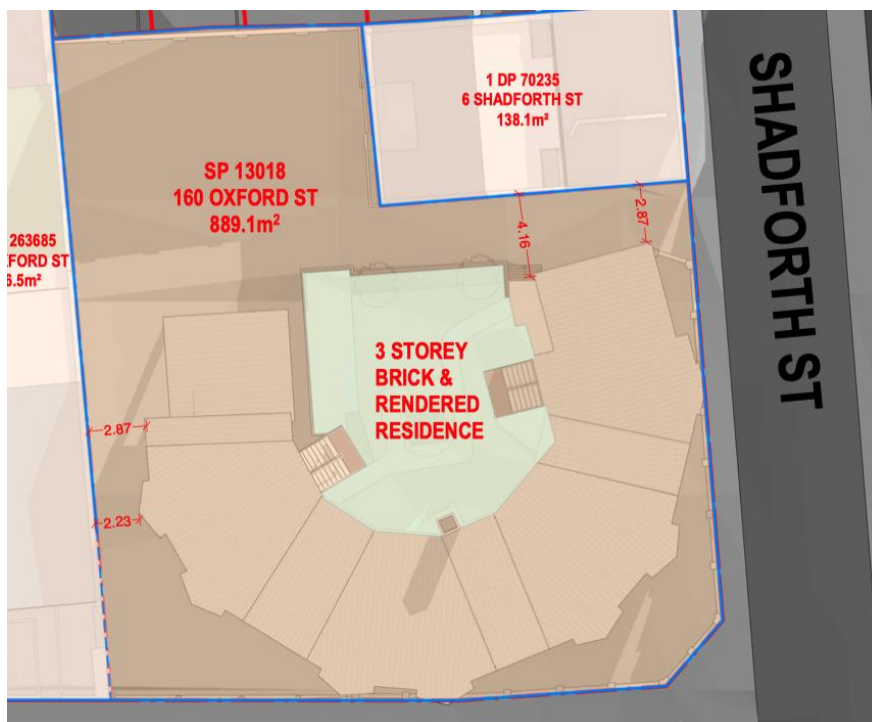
Site Plan of Existing Residential Flat Building at 160 Oxford Street
